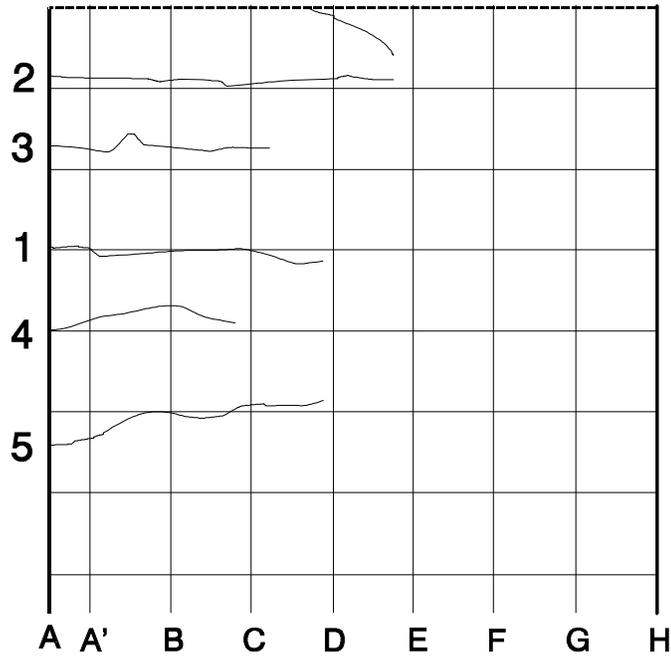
POJ-RC-100-TH cracking pattern on north face of pier at dead load
